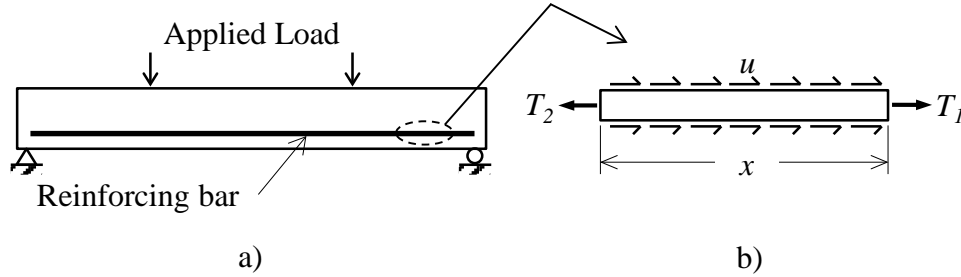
Bond stress and development length in plain reinforcement – Modified from Drysdale and Hamid (2005): a) beam under flexure, and b) bond stress on the surface of the reinforcing bar as a result of the applied load.
